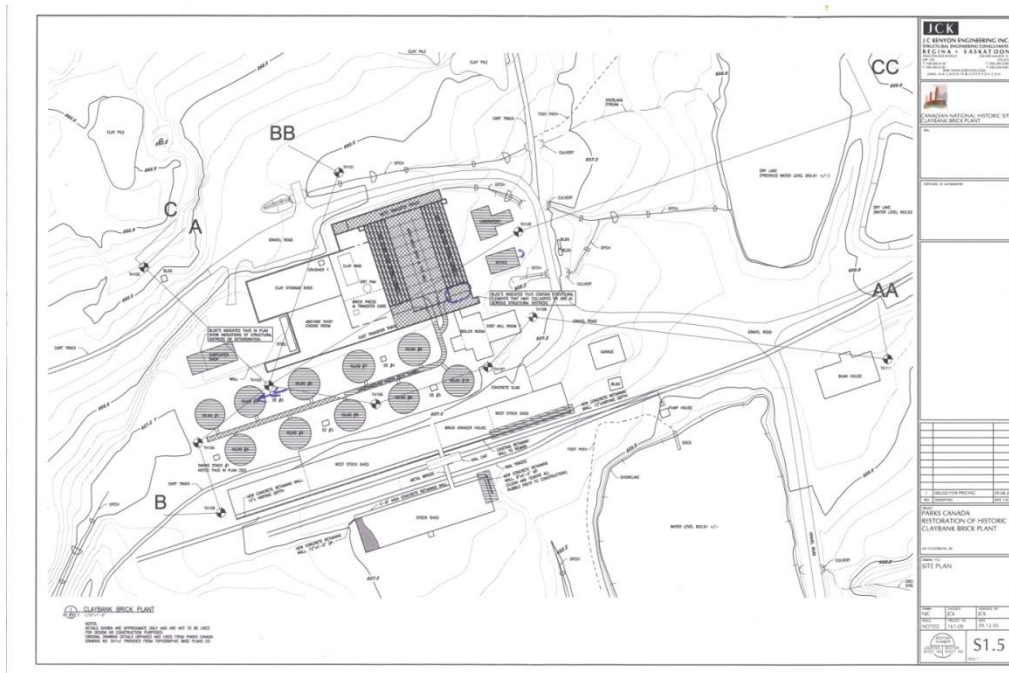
Clay Bank Brick Plant site plan including site grading pattern.
